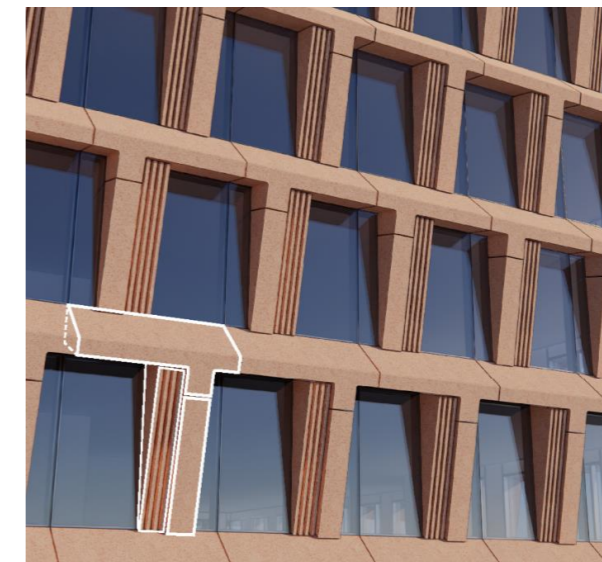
Example of curtain wall façade panels showing solid elements, louvred sections for ventilation and glazing
